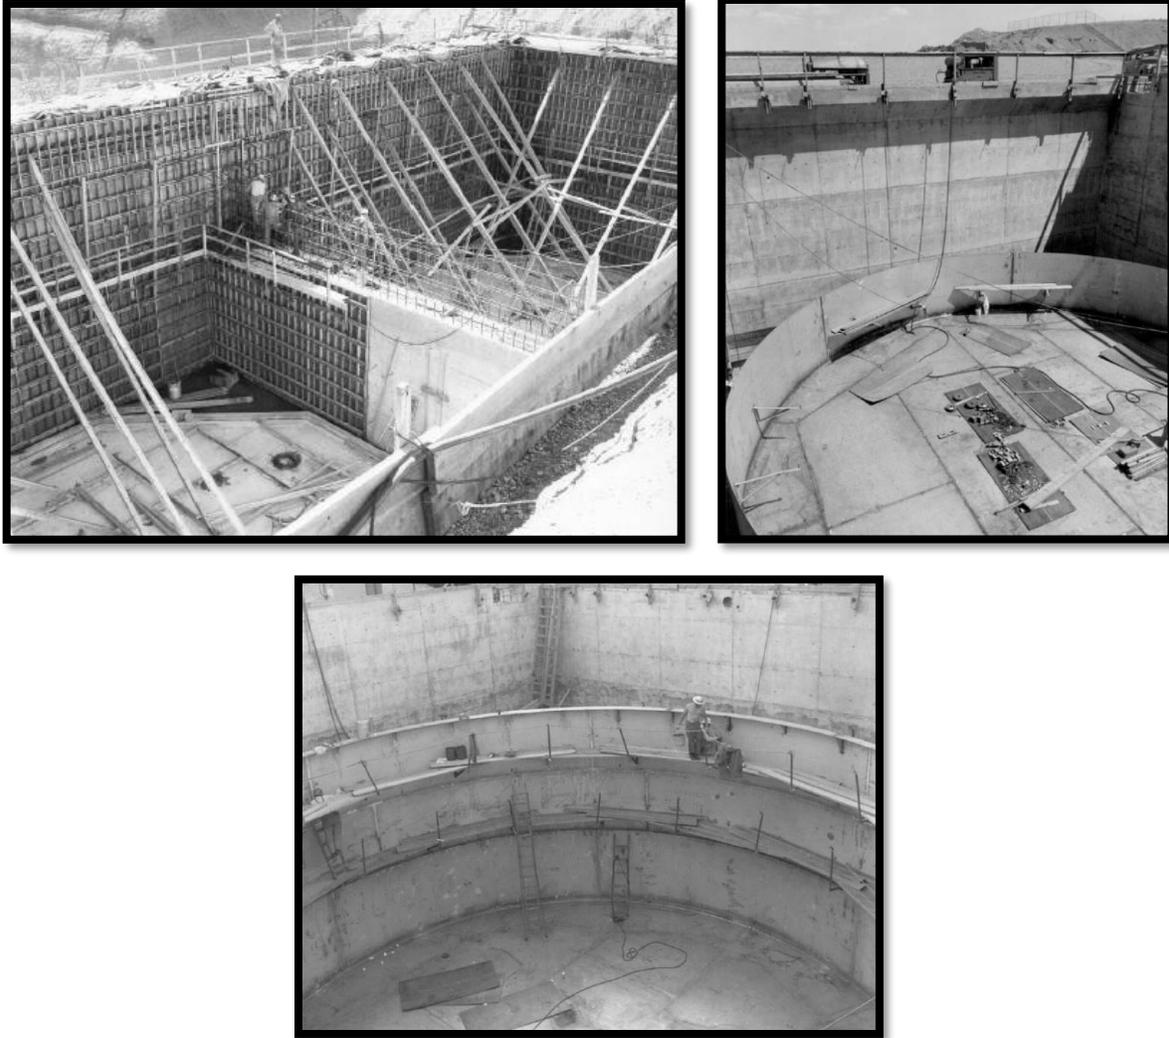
Construction of SBW concrete vaults tanks WM-187, WM-188, WM-189, and WM-190.
